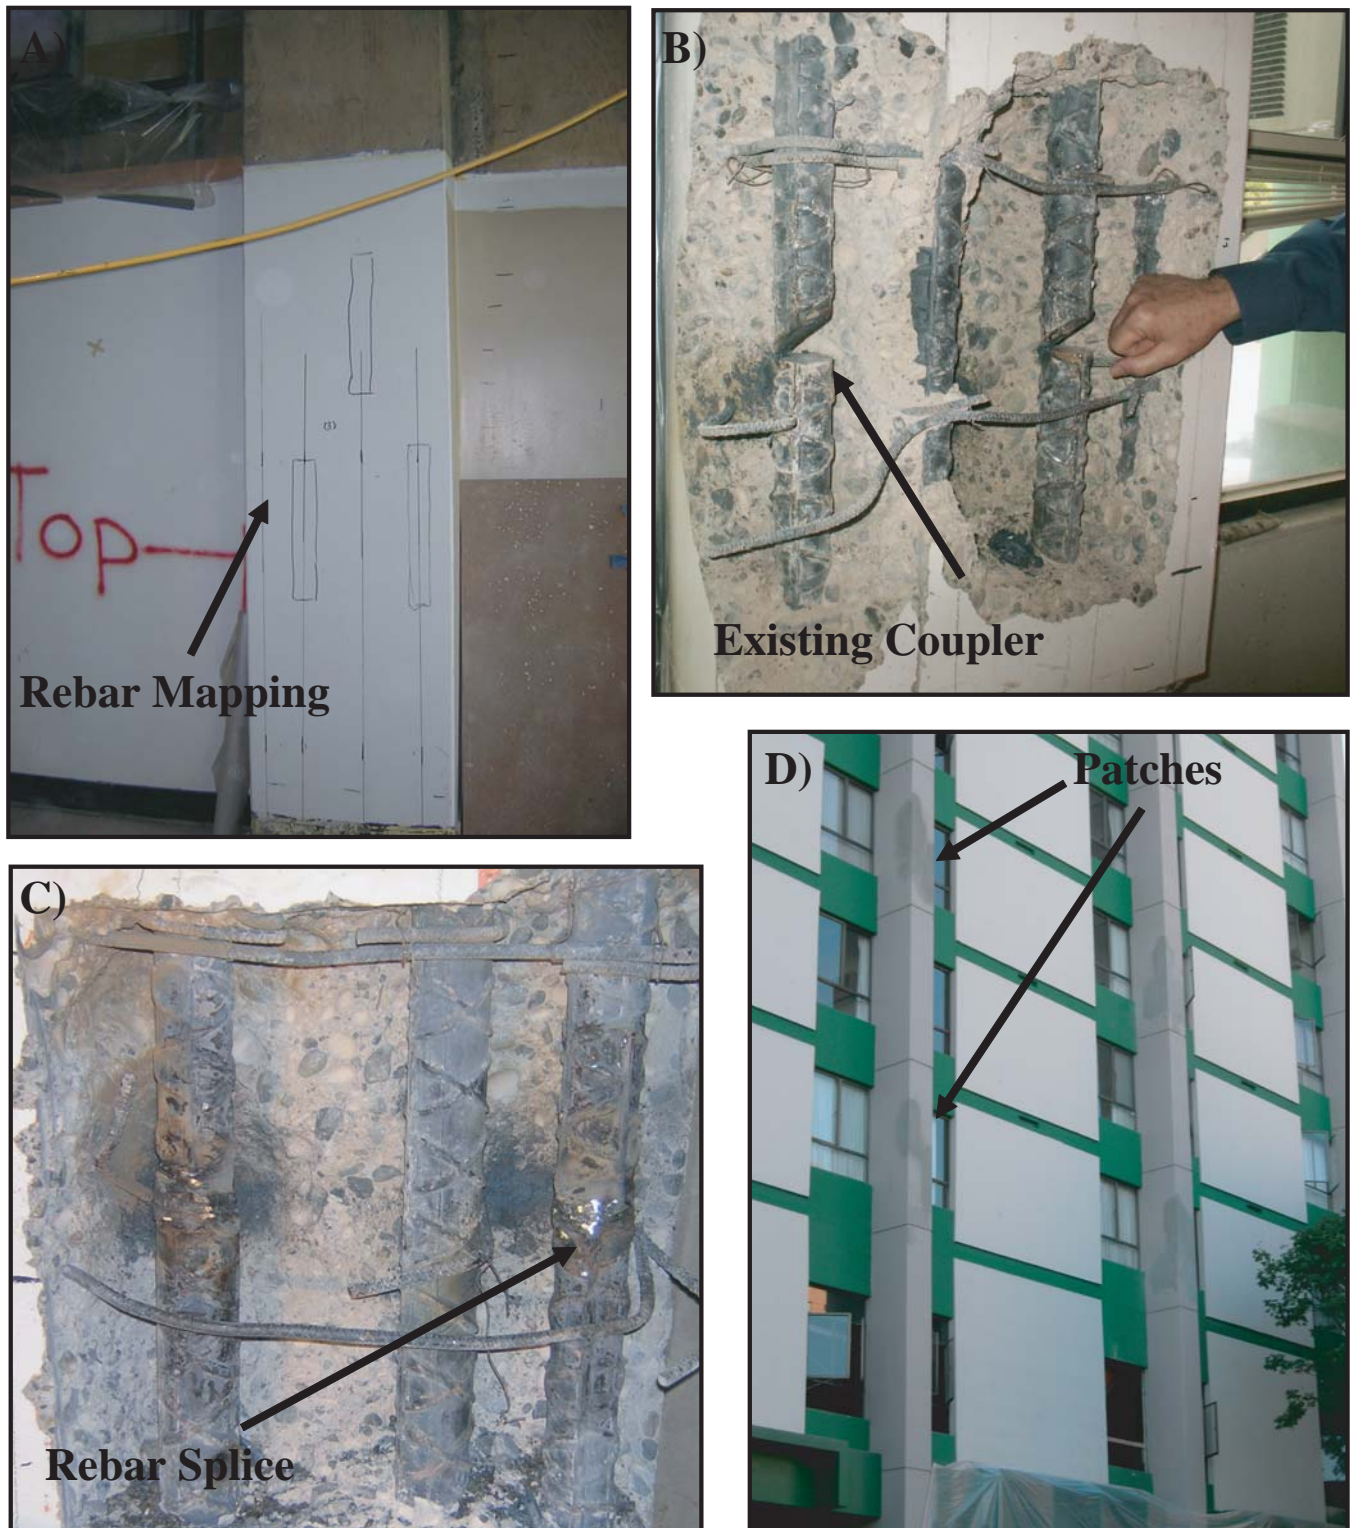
Construction process used to connect vertical rebar: (A) rebar mapping destructive tests expose inadequate rebar coupler, (B) existing coupler, (C) close-up of splice used for coupler repair, and (D) cement/concrete patches following coupler repair.
